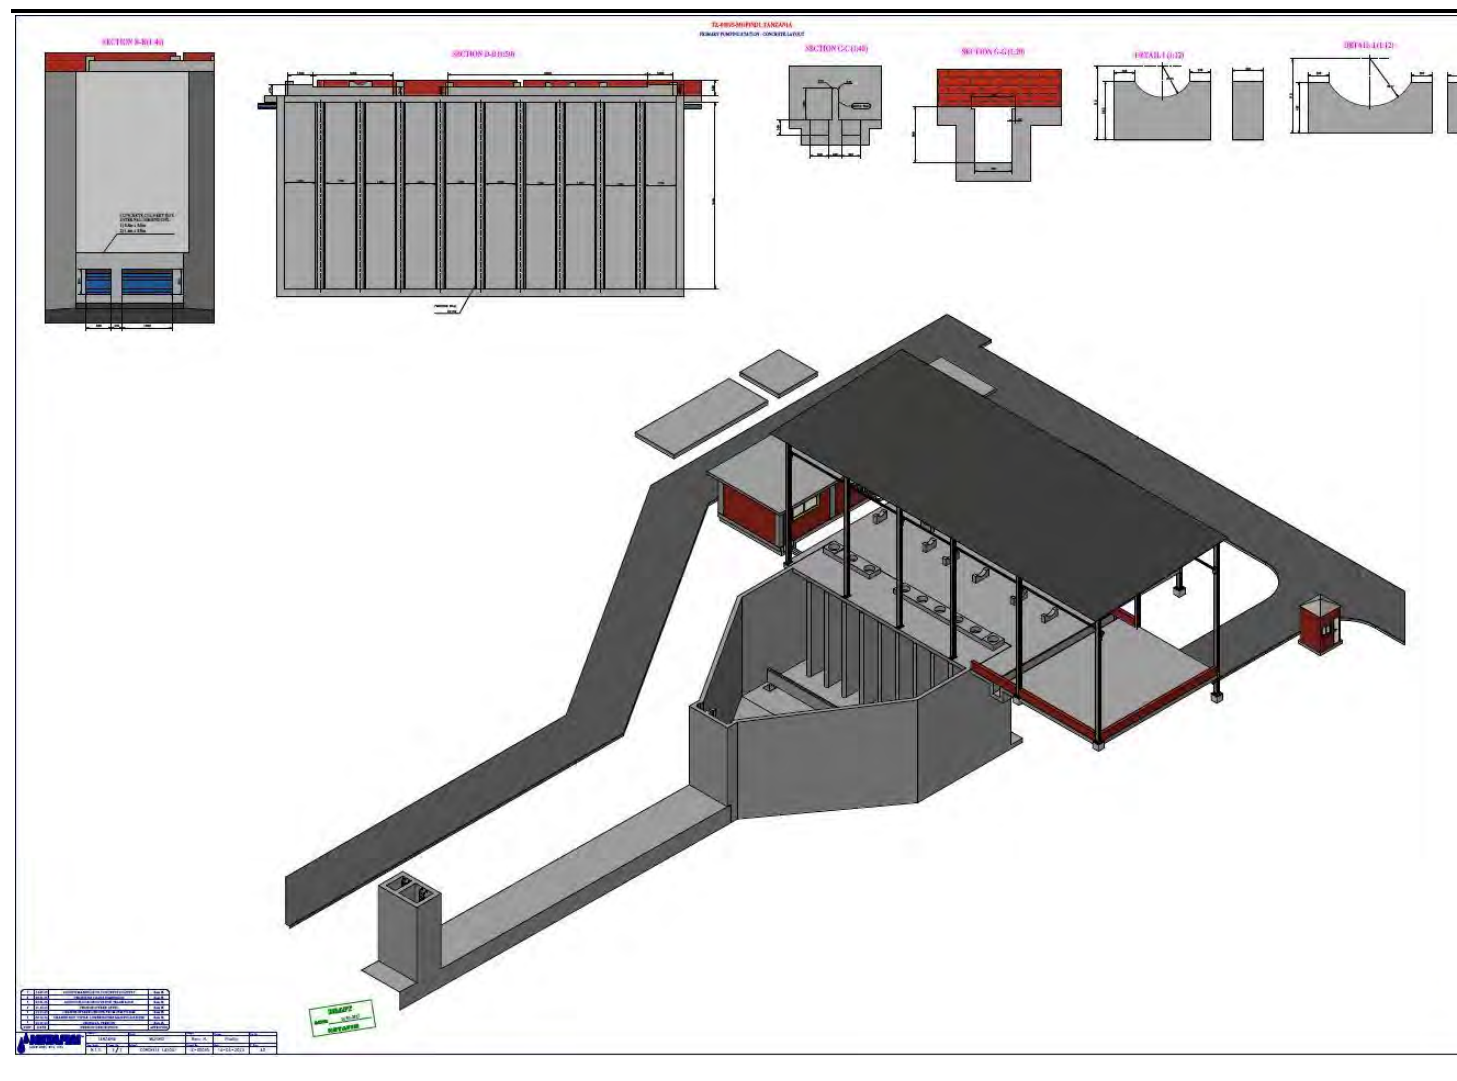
FACTORY DESIGN AND LAYOUT
